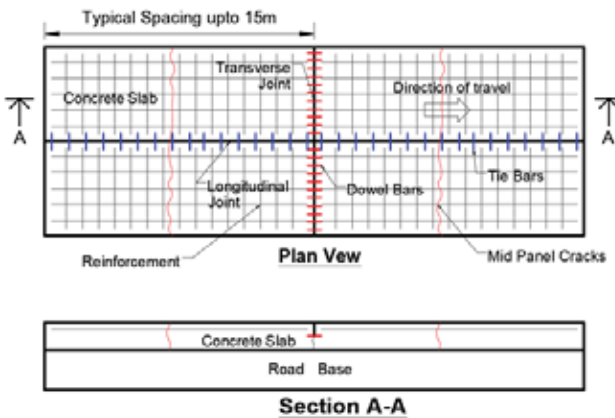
Jointed Reinforced Concrete Pavements(JRCP)
